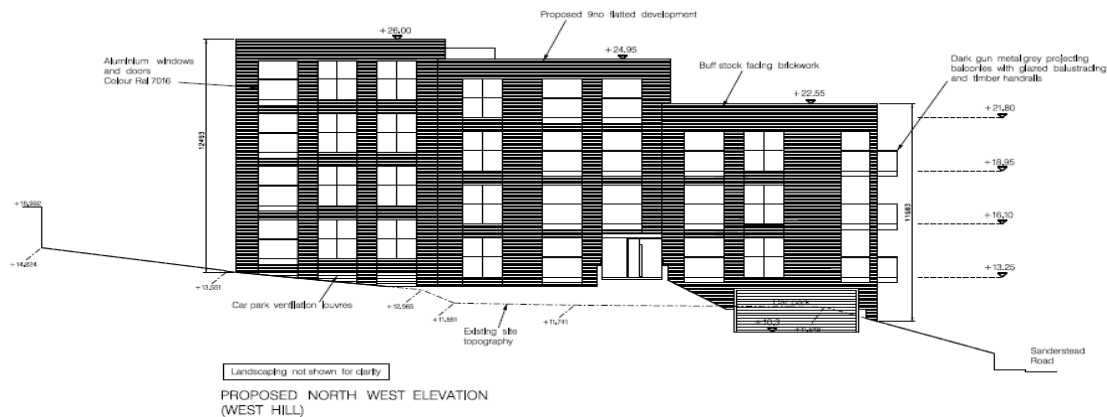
Front Elevation of the redevelopment of Land Adjacent 2 West Hill
